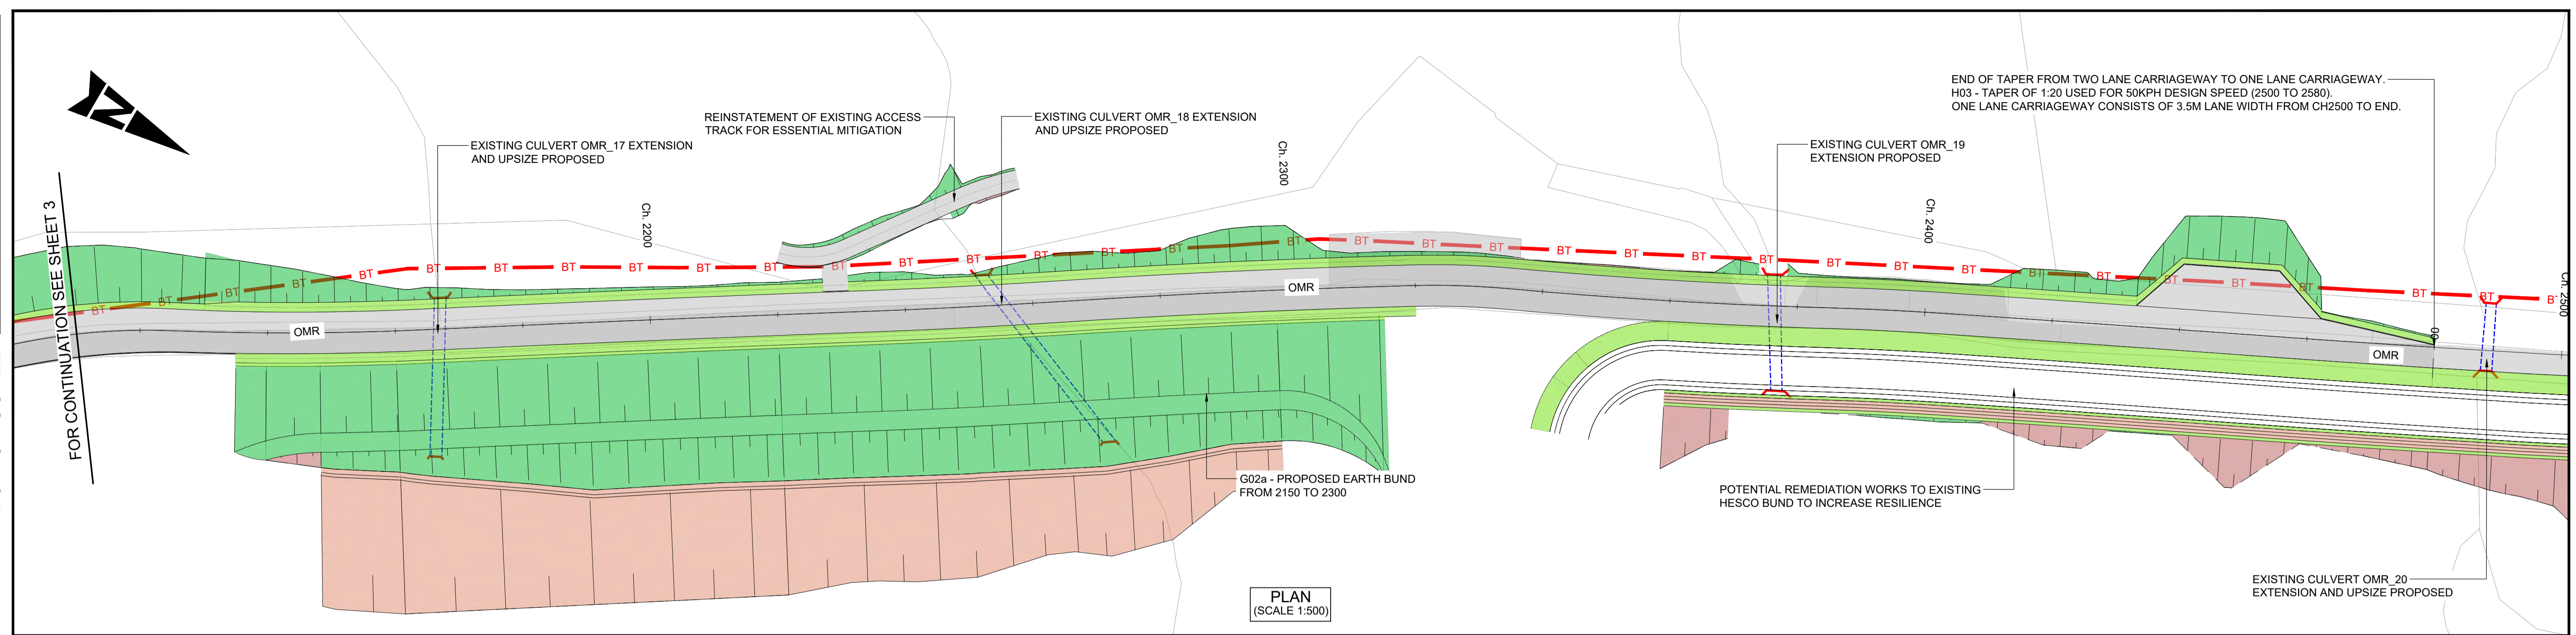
Drawing Number: A83AAB - AWJ - HGN - MTS_MBO - DR-CH-000052
